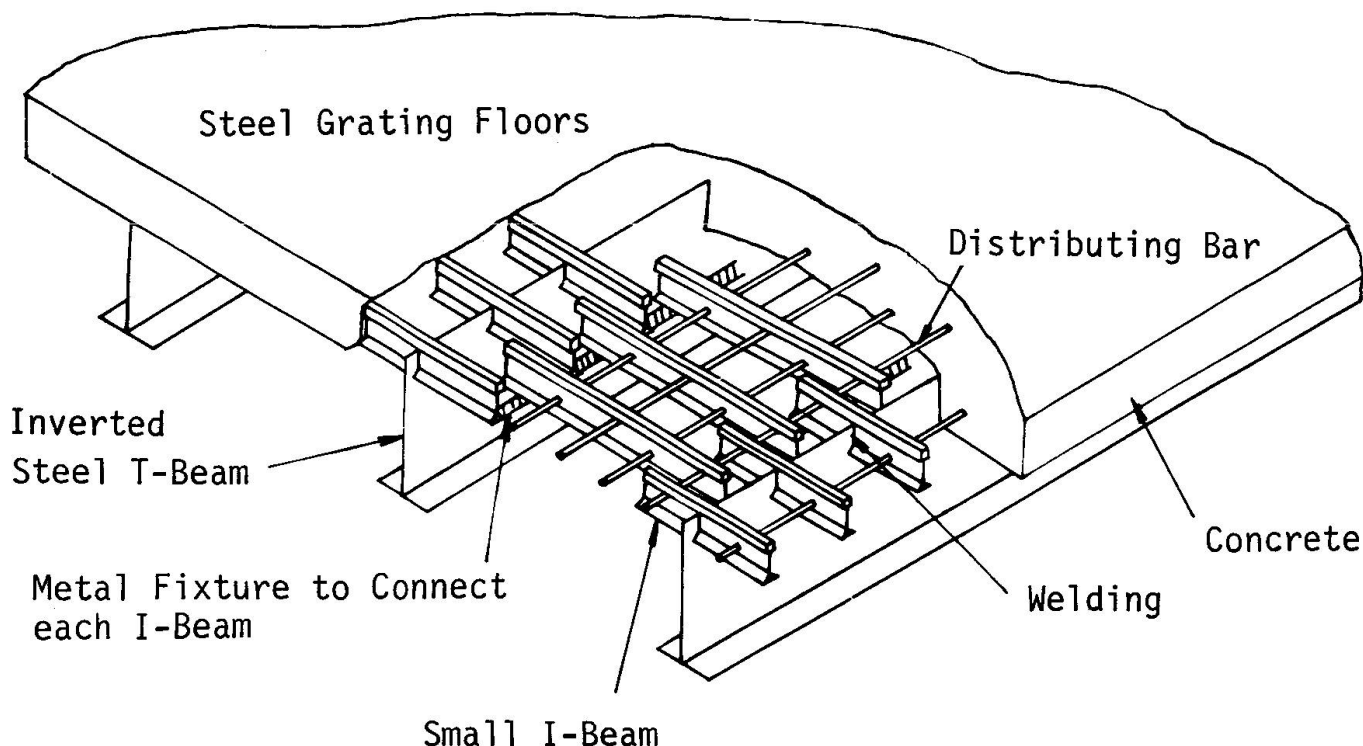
Schematic Sketch of Prefabricated Composite Girder with Inverted T-beams
